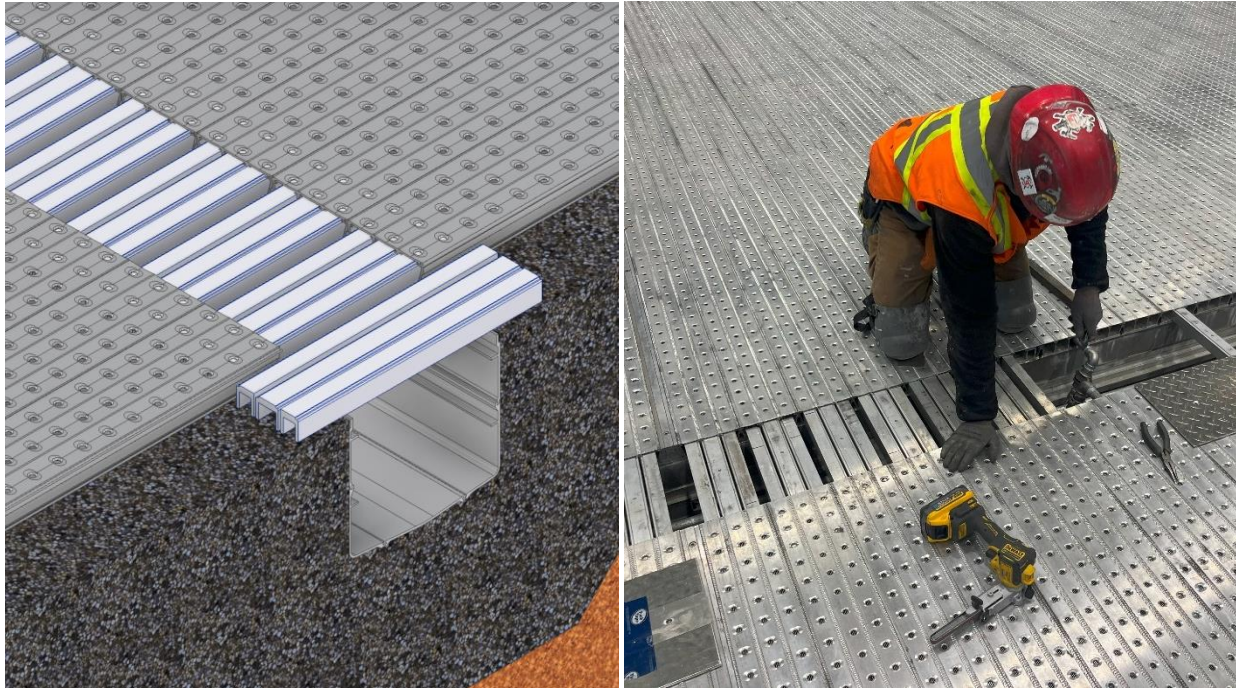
Rendering of aluminum trench and concrete slab showing force transferred from aircraft tire to concrete. First profile removed to show girder which spans beyond the width of the trench.
